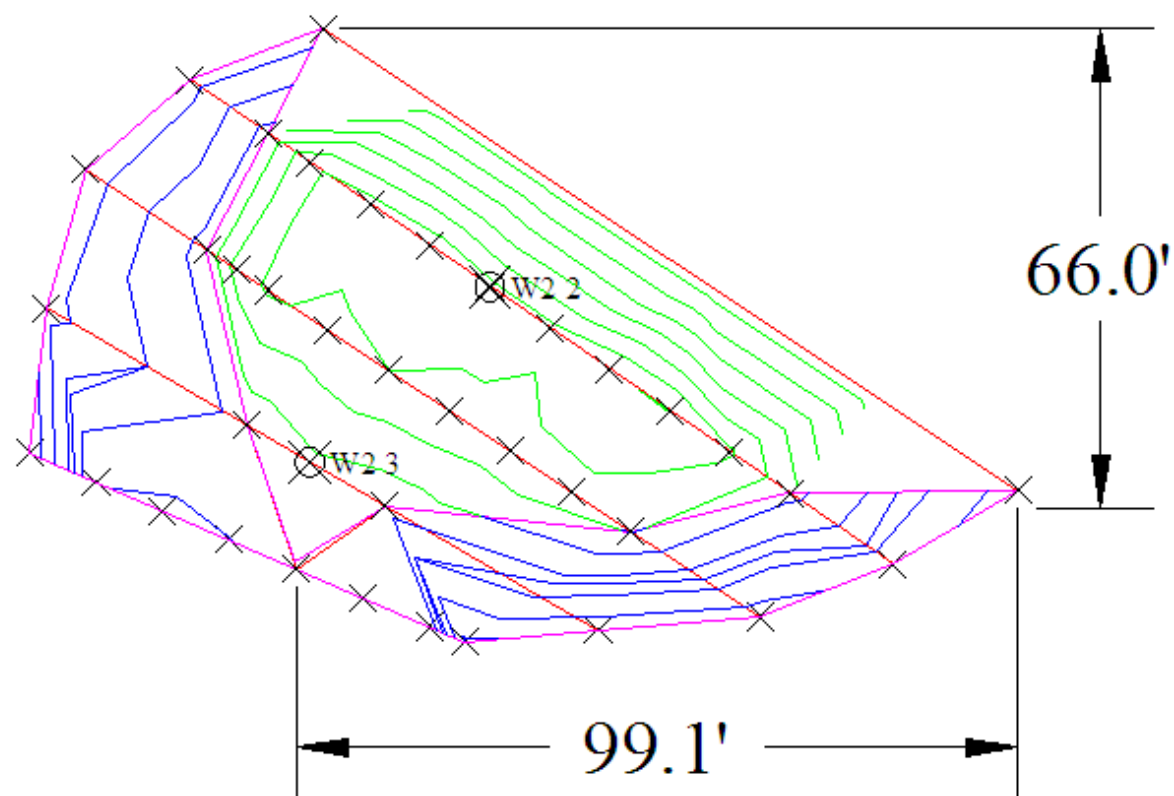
AutoCAD layout of Wilson2 site showing pond (red outline), sediment toe (purple outline), bathymetric survey points, and core locations, contours represent pond sediment bottom, dimensions in feet.
